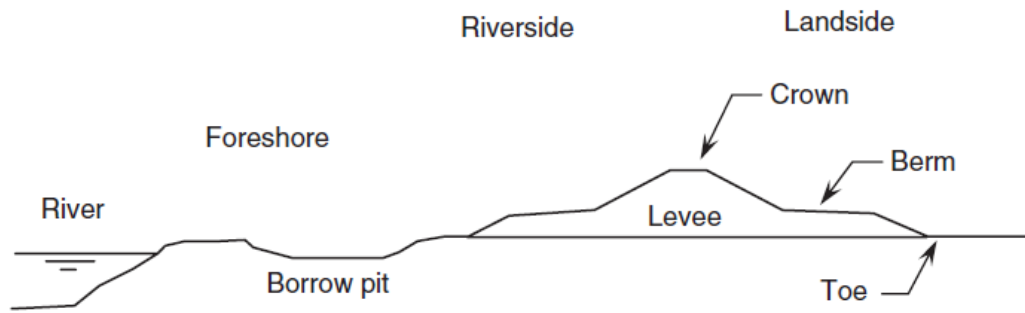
Example of cross section of flood embankment (Phoon, 2008).
